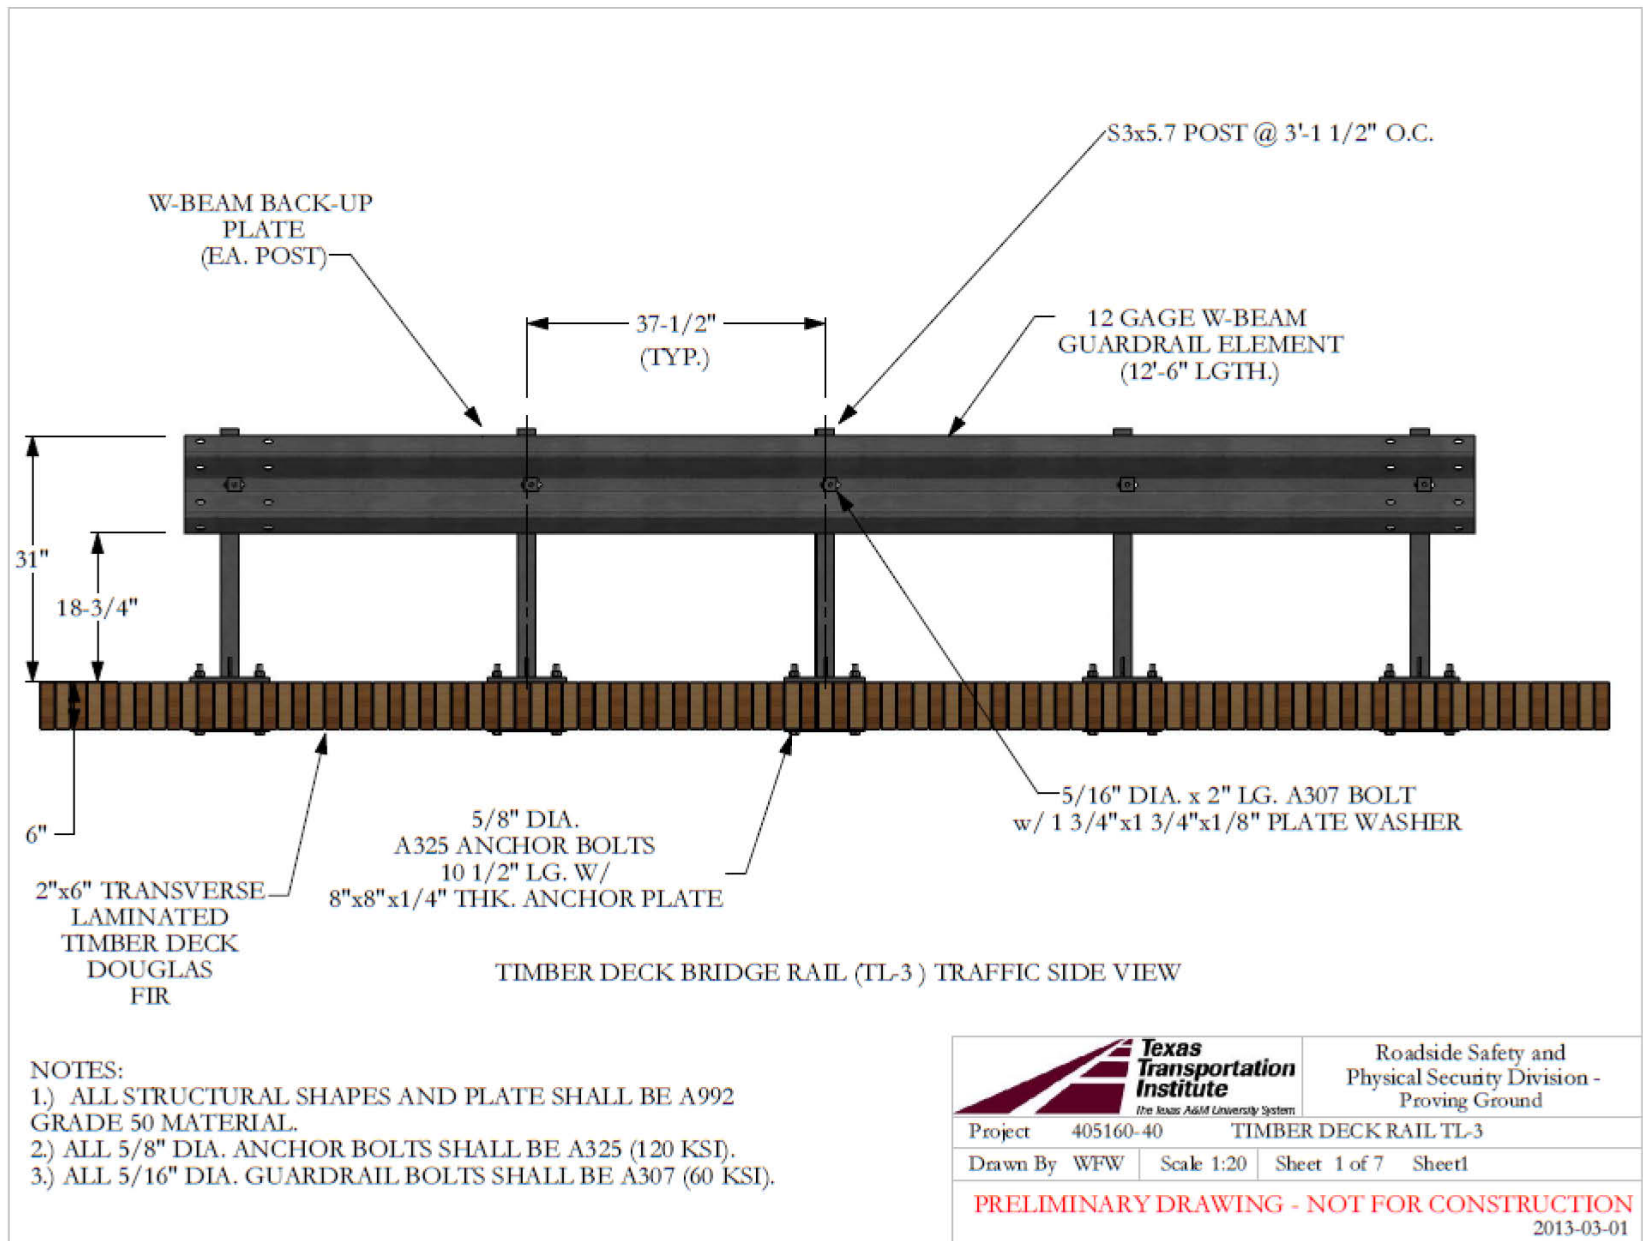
Details of W-Beam Bridge Rail for Temporary Timber Deck Bridge
